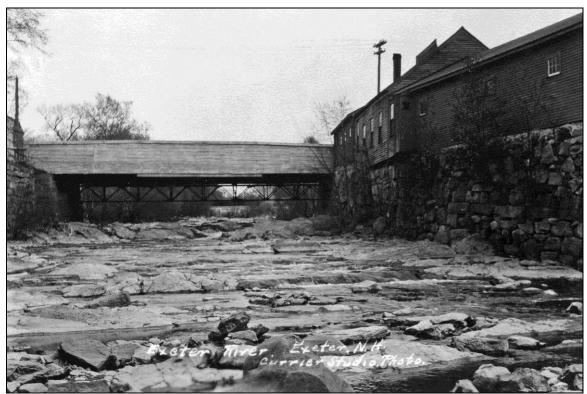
Photo of String Bridge, c. 1900, showing downstream side of west span, a boxed wood pony truss built 1888. Note water main carried on its own steel truss below bridge, installed between 1898 and 1904, according to Sanborn maps (Exeter Historical Society).
